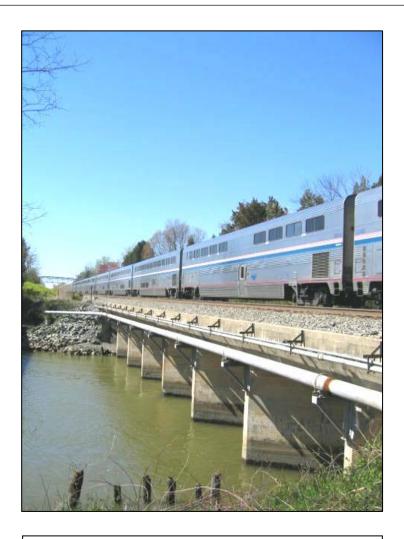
CSX Bridge at approximately MP 74.3 over a private road and un-named stream. This bridge is considered a SMALL railroad bridge for purposes of this study.
